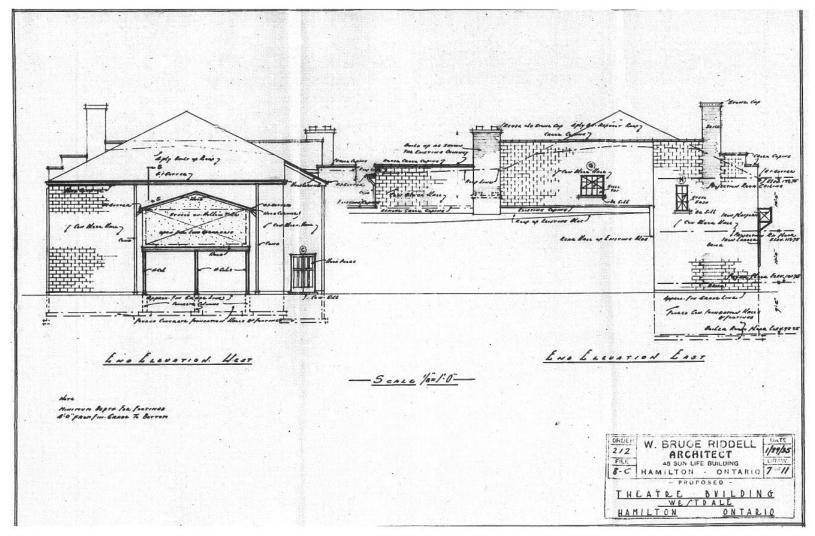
West Elevation Drawing with Loudspeaker Cabinet (left) and East Elevation (right)
